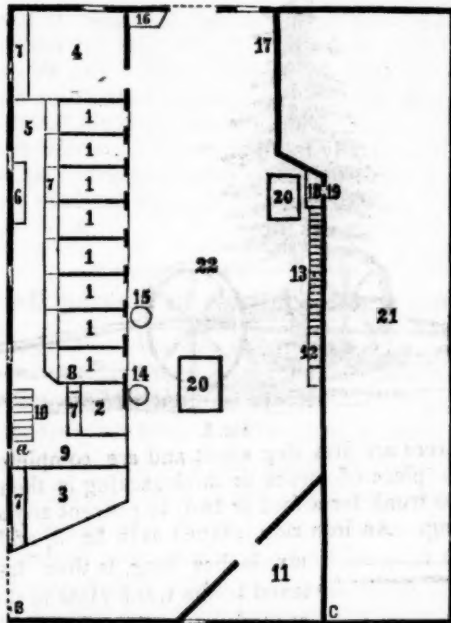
GROUND PLAN OF BASEMENT—36 by 70 feet, 8 foot walls. . .
